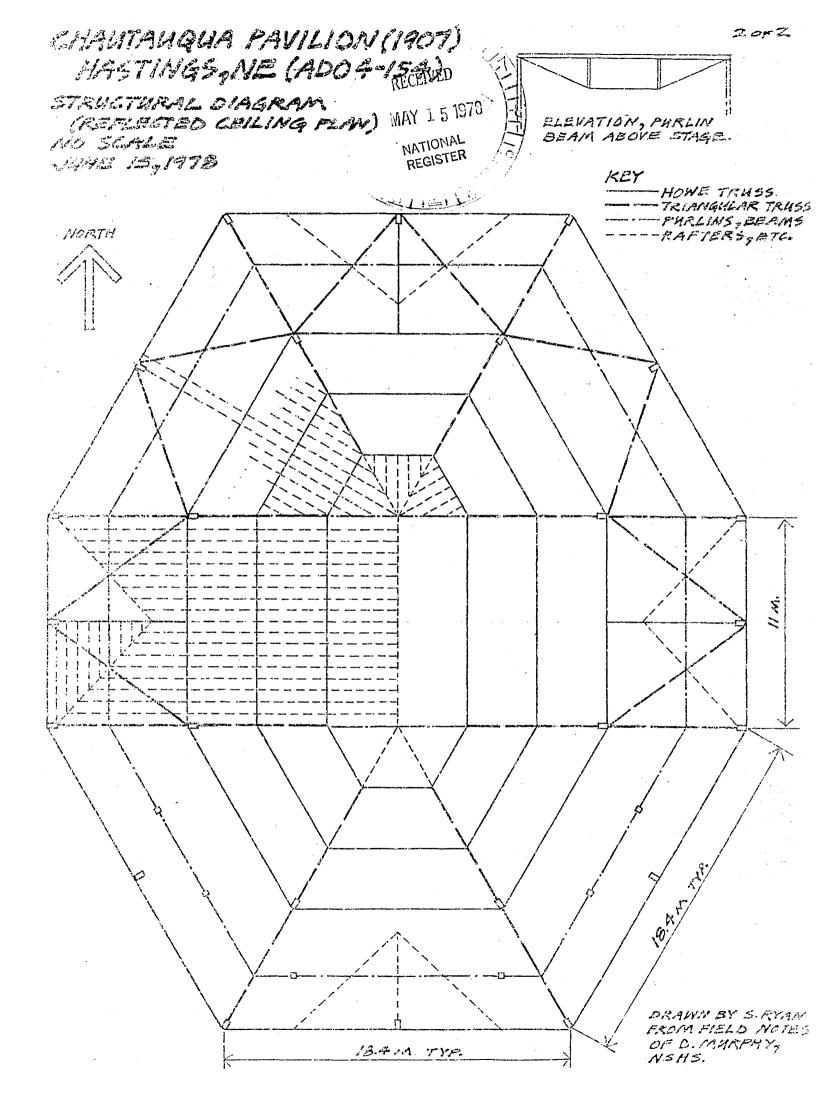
Chautauqua Pavilion, Hastings, Nebraska D. Murphy, NSHS, June 1976 Nebraska State Historical Society Structural diagram-reflected ceiling plan (no scale).
